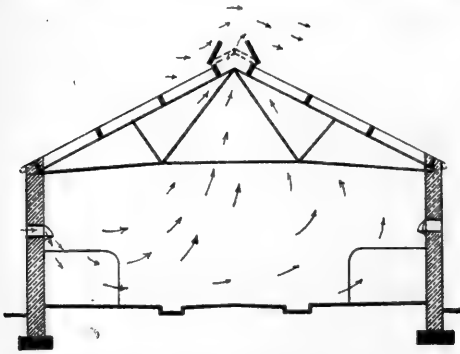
Findlay's method of ventilating a cow-shed. For details of construction see the text.
